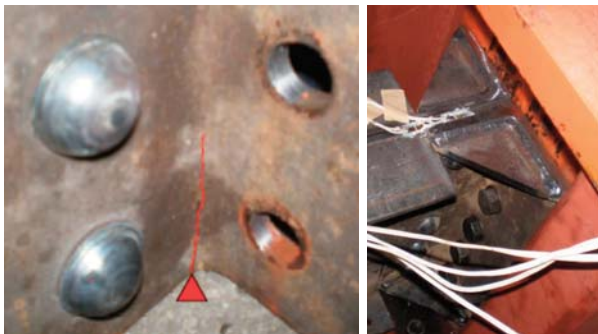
Failure of specimen due to crack in the angle and reinforcement of this detail
